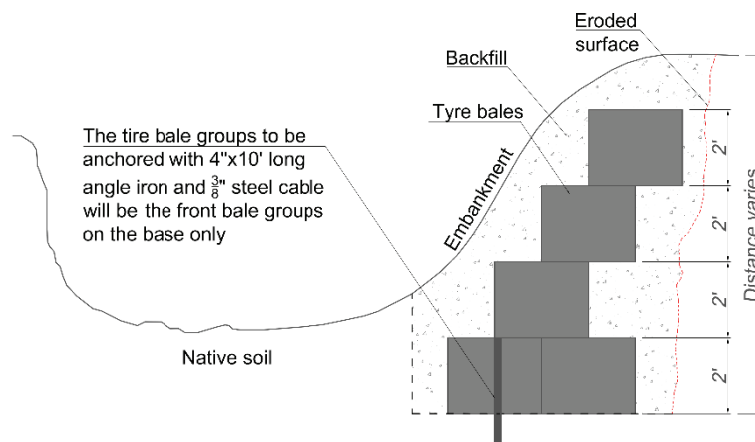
Typical cross-section of the tyre bale gravity walls constructed in New Mexico
